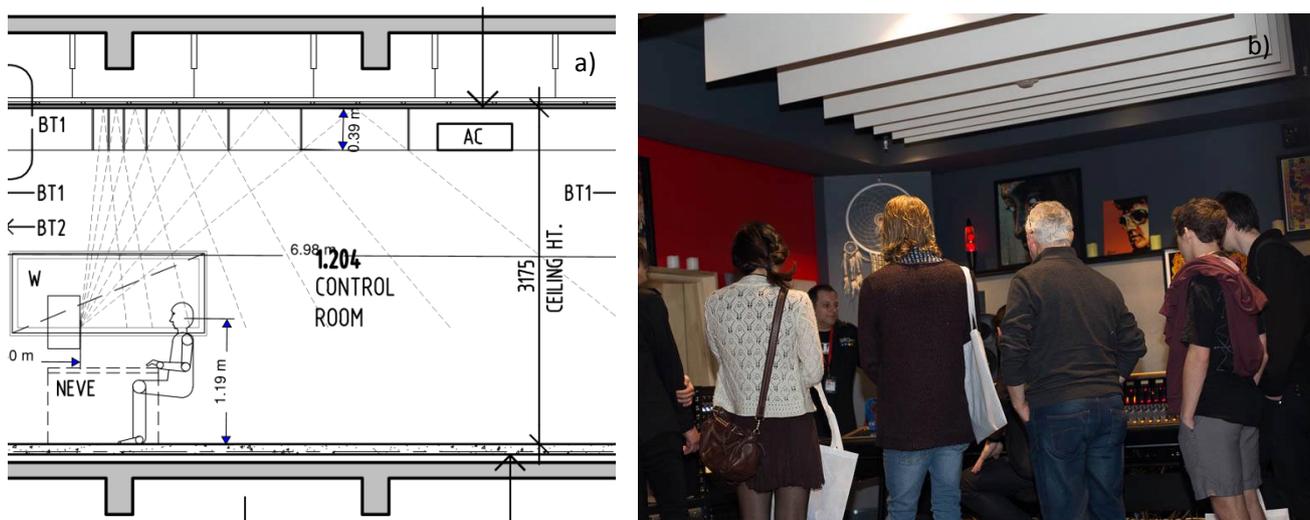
Control Room Ceiling First Reflection Treatment. a) Room section showing loudspeaker source and ceiling baffling. b) View of ceiling baffles in control room.
